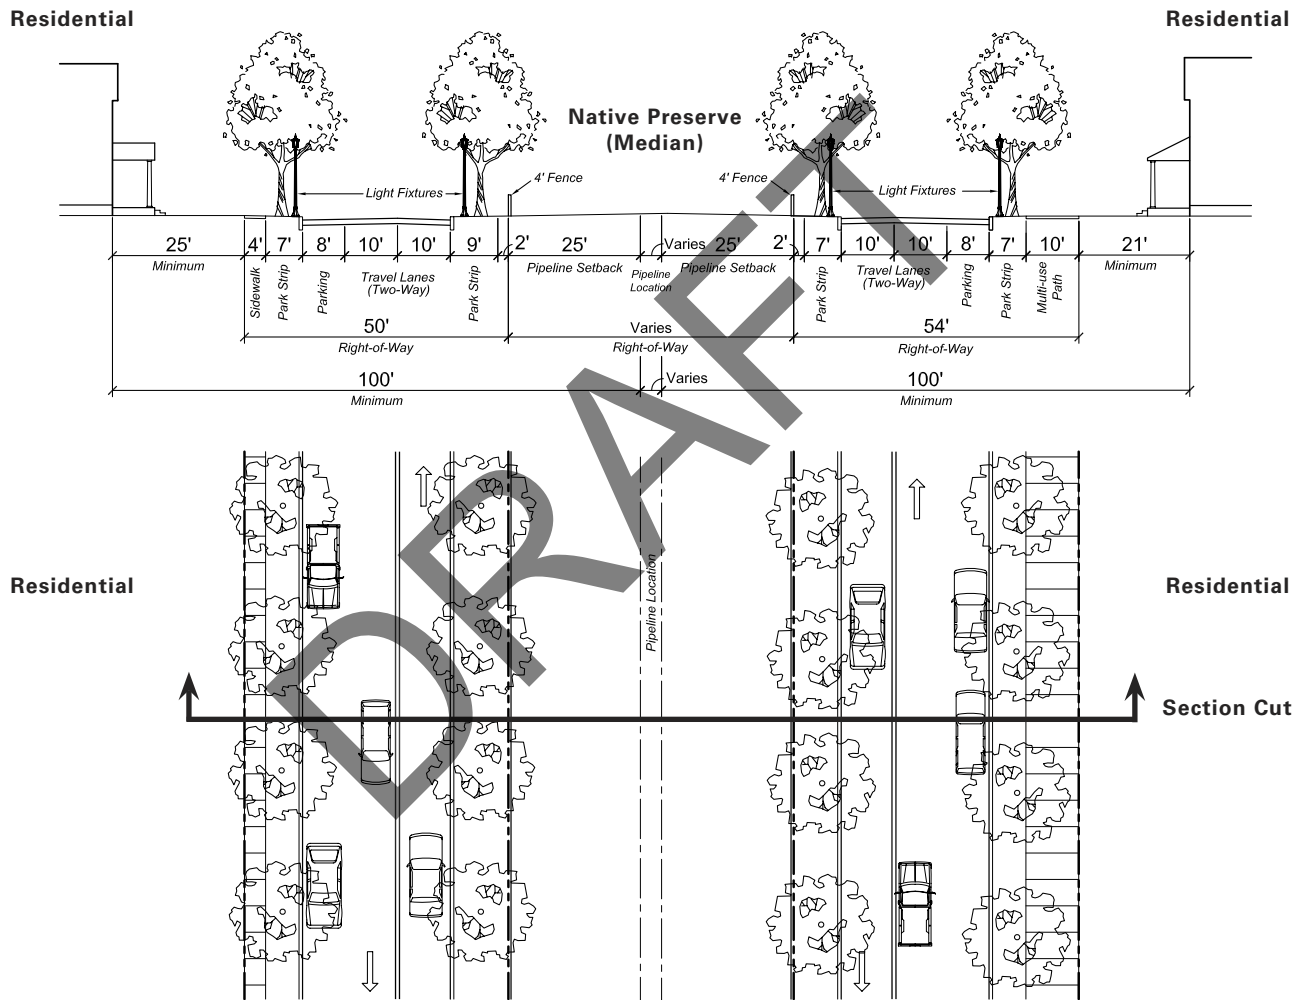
Proposed Section and Plan: Neighborhood Street F
